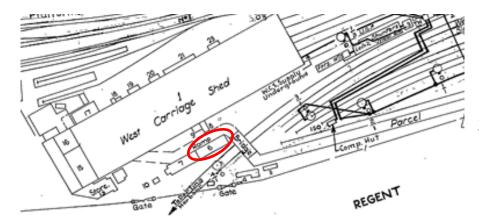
1953 lighting plan of Sydney Yard. Source: Sydney Trains Virtual Plan Room
